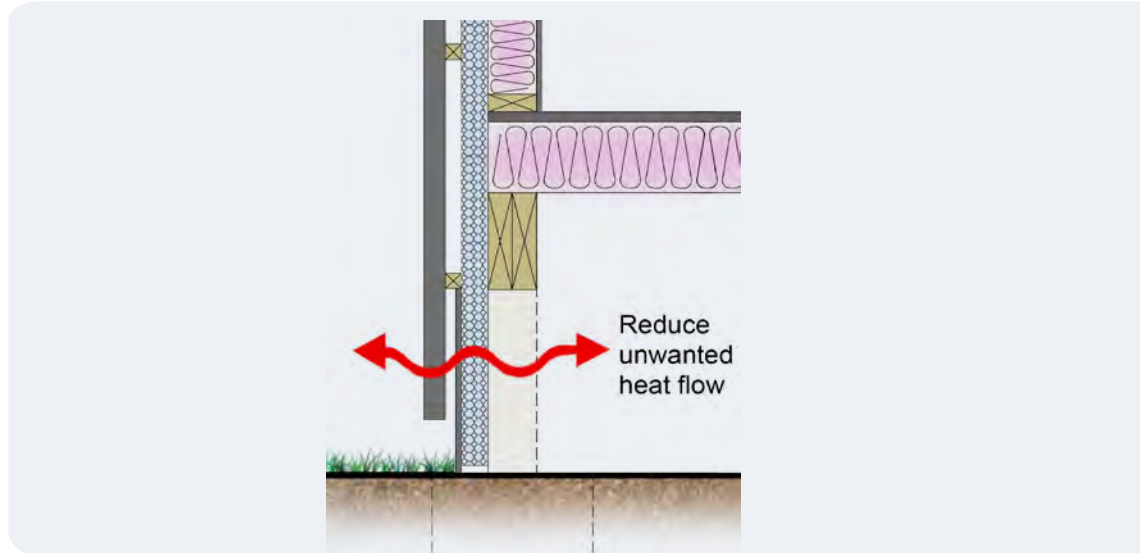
Insulation of sub-floor walls. Continue insulation to ground in accordance with manufacturer's detailing.
